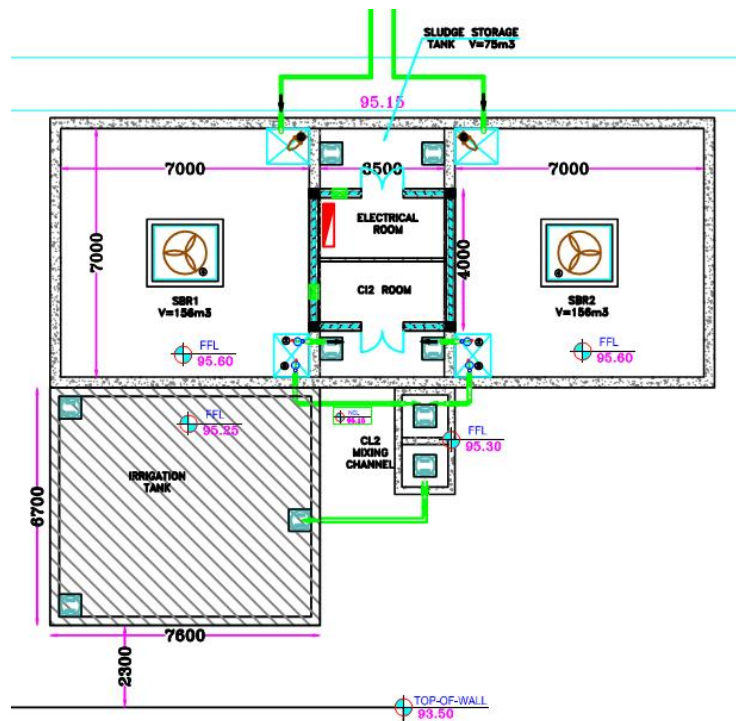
Top view plan of the PSD wastewater treatment plant.
